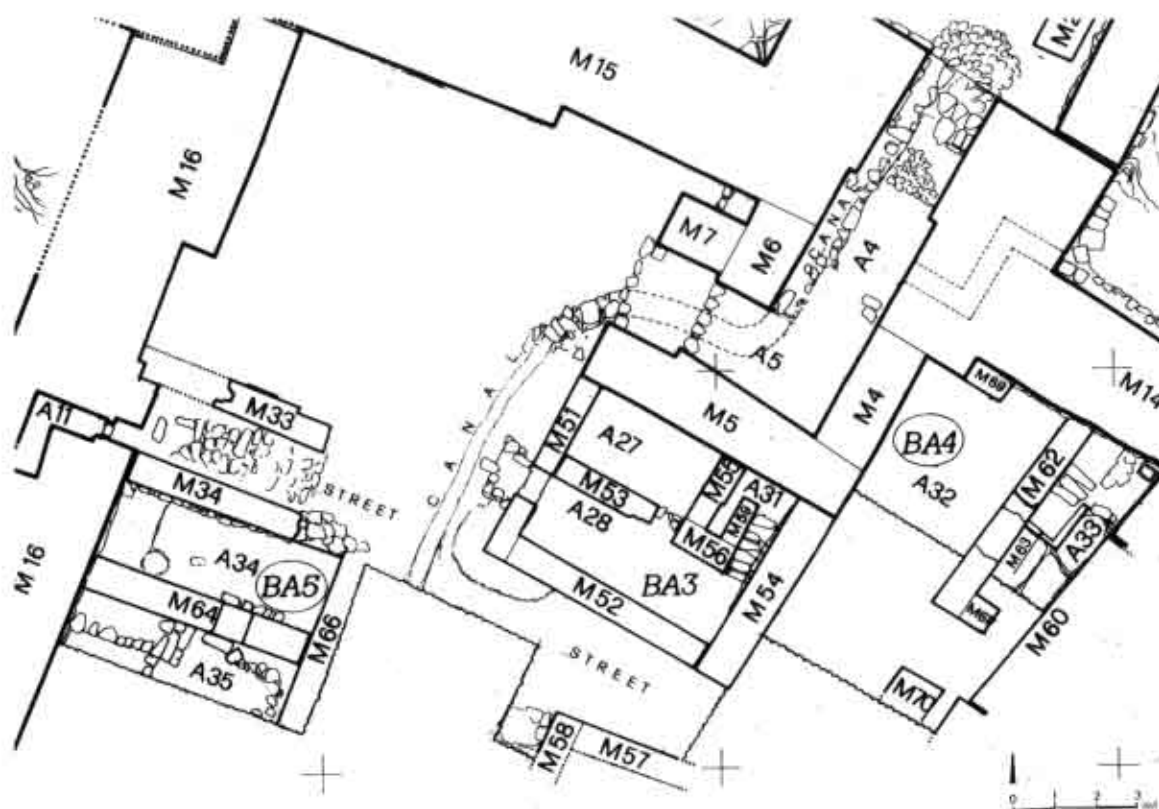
Sumhuram: Area A, plan of Building BA3.
